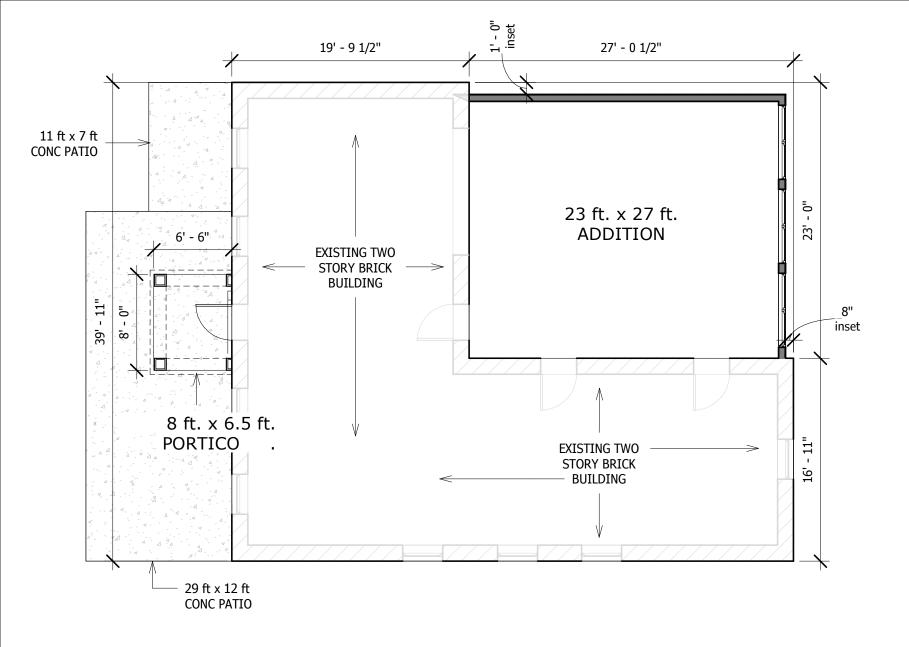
DETAIL - Entry Portico Stephen & Robin Mingione1030 Park Ave.
